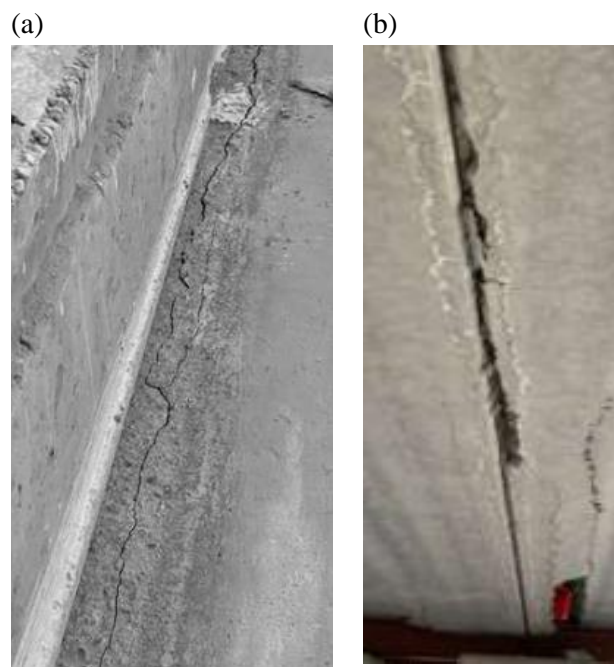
Longitudinal cracking (T3F2). (a) Top of floor, cracking along the grout of the joint; (b) Bottom face of floor
